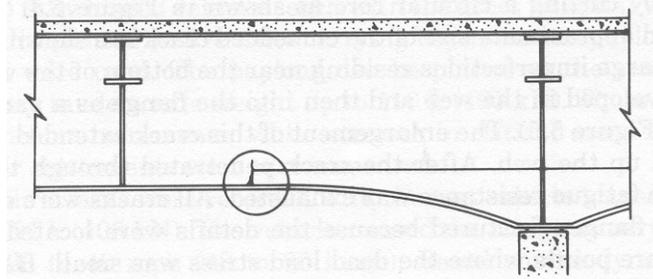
Cracked end of haunch insert on Aquasabon River Bridge (Fisher 1984)
